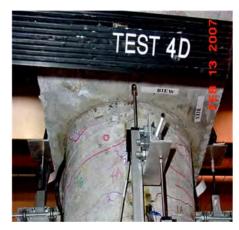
Apparent damage states for bent 1 East column bottom plastic hinge
